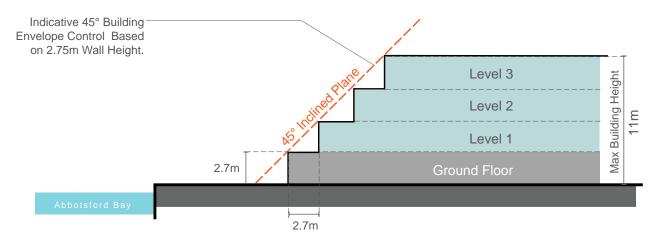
Indicative 45° Building Envelope Control based on 2.7m wall height
